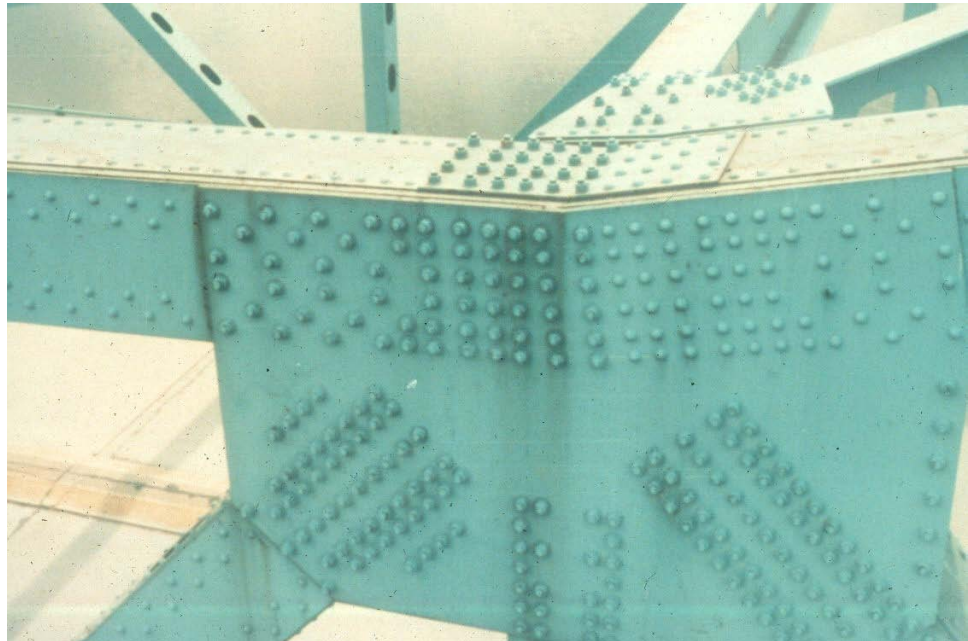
Truss Panel Point using Shop Rivets and Field Bolts
